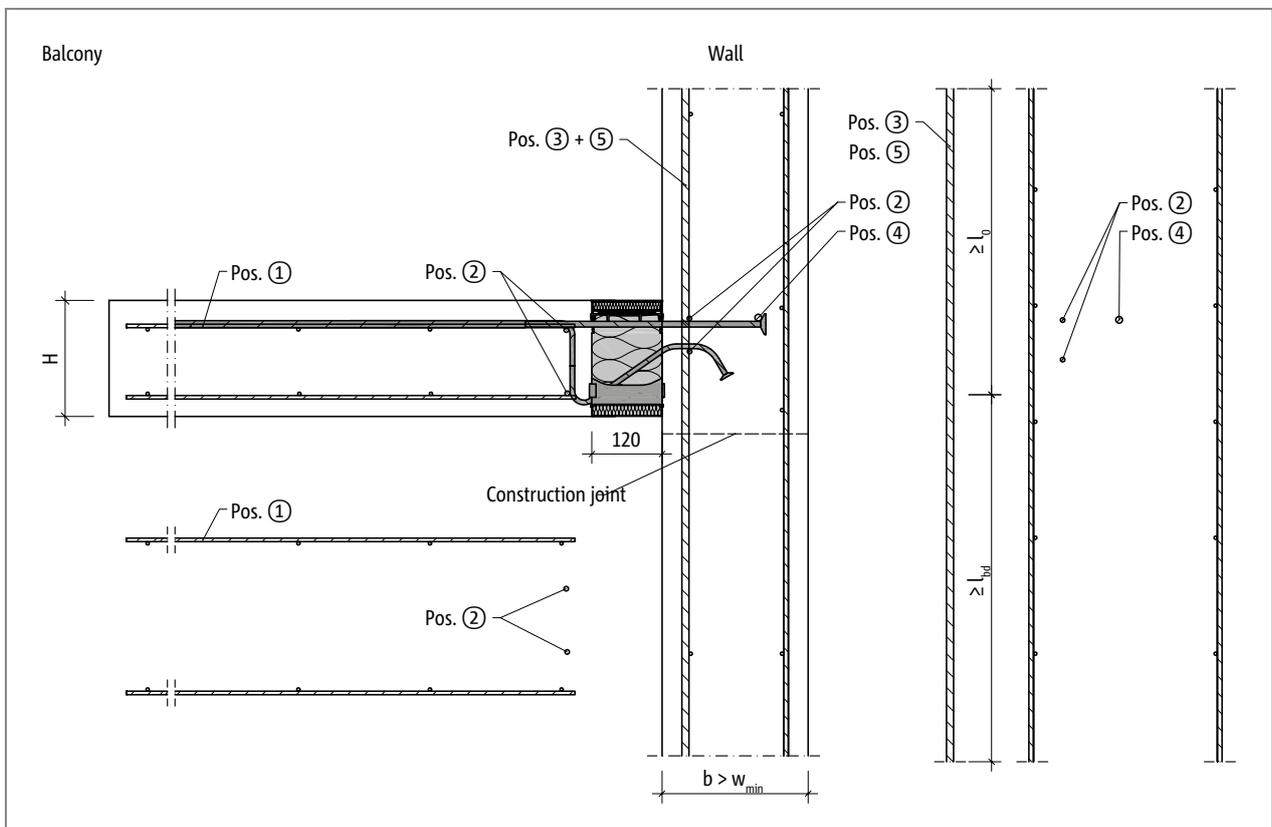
Schöck Isokorb® XT type K-U: On-site reinforcement for wall connection upwards with larger structural element dimension ($w_{vorh} > w_{min}$)
